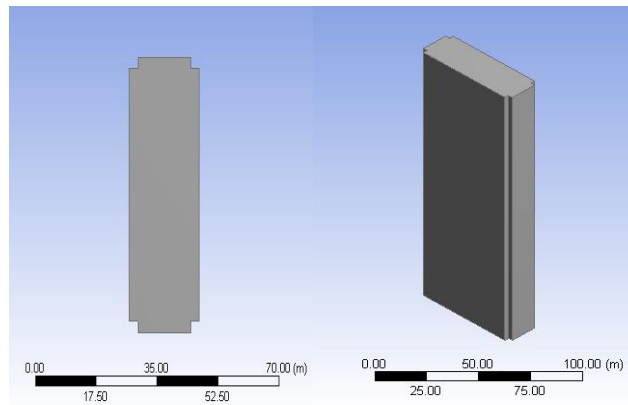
Plan and isometric view of rectangular model with Single Step at Corner
